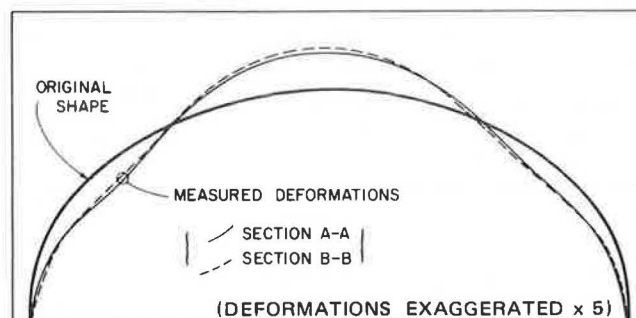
Final deformed shapes of Measurement Sections A-A and B-B.
